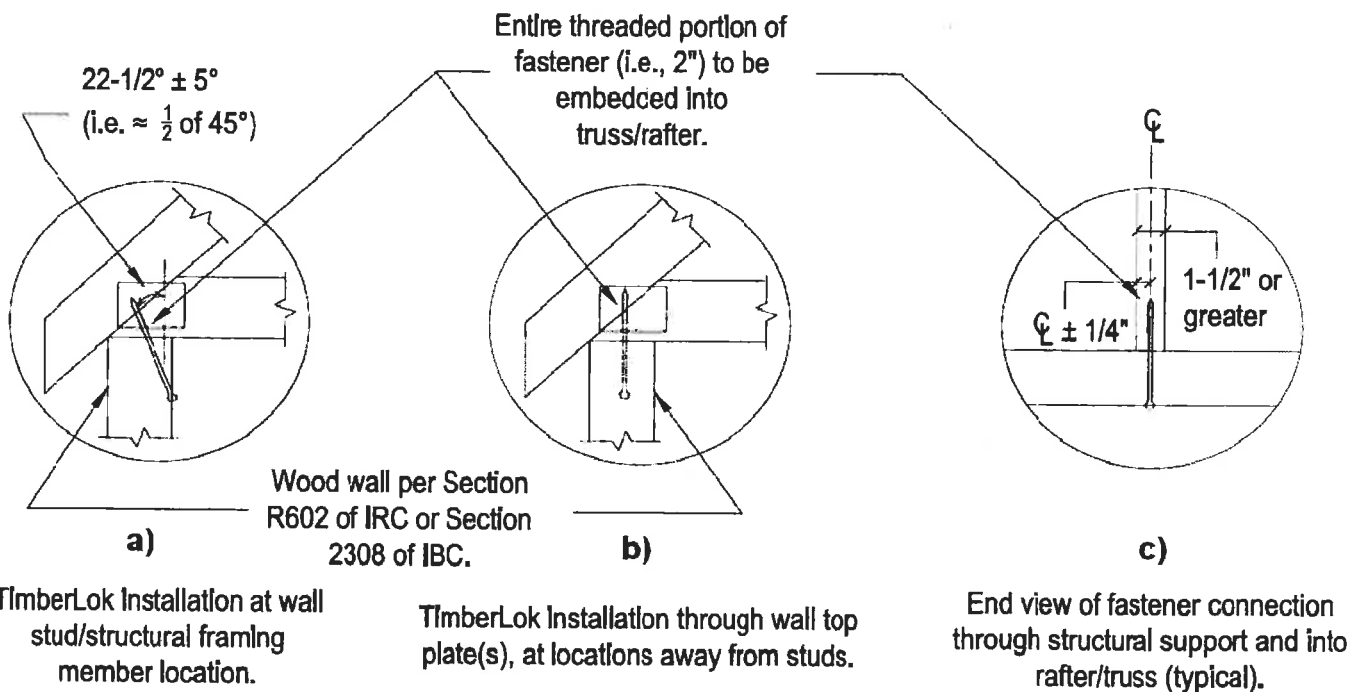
, 2b and 2c: Fastener Orientation Requirements for Attaching Wood Trusses, Rafters or SCL from Below to the Top of a Wood Wall or Structural Framing Member
